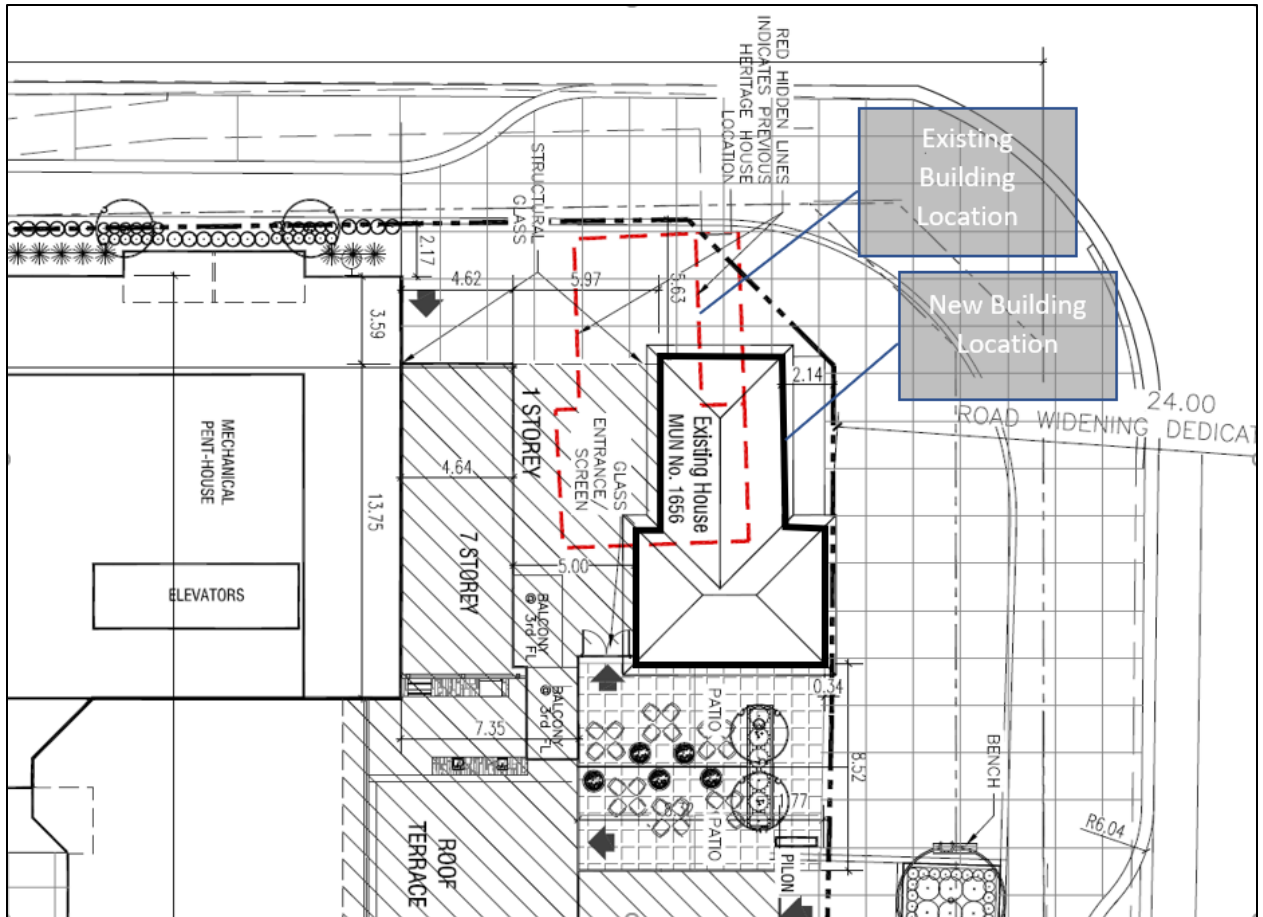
Relocation of Existing Heritage Structure (Site Plan Extract)
